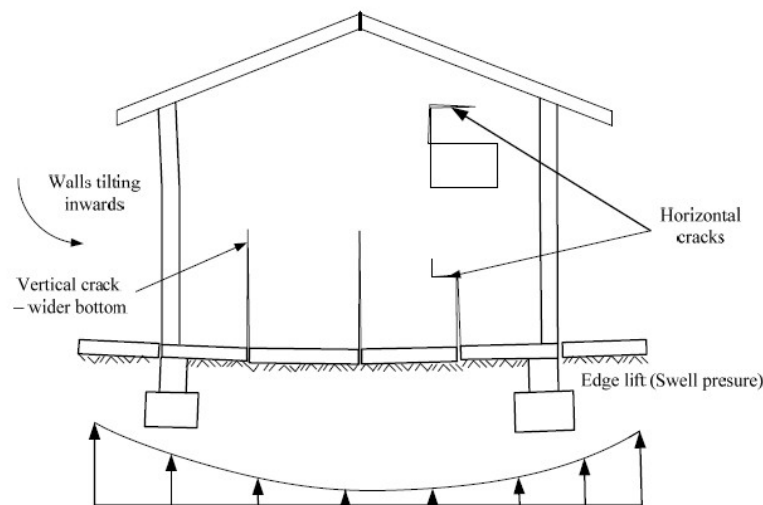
Typical crack pattern on a building due to centre dishing[43].
